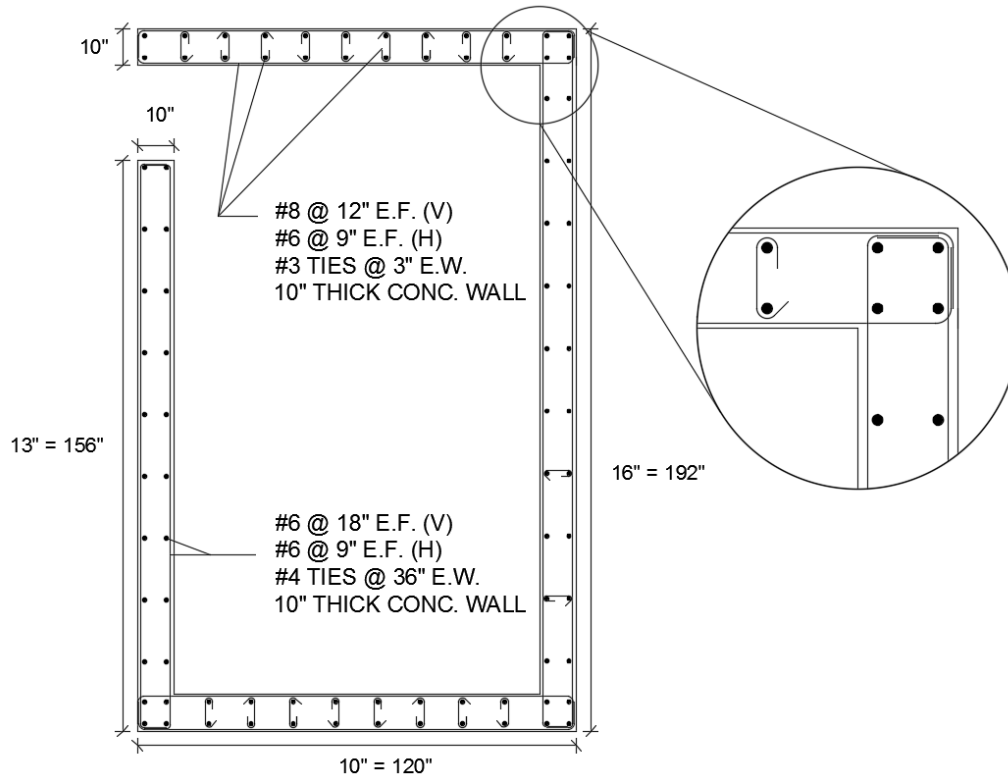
New stairwell shear wall cross-section at the 4th floor level
